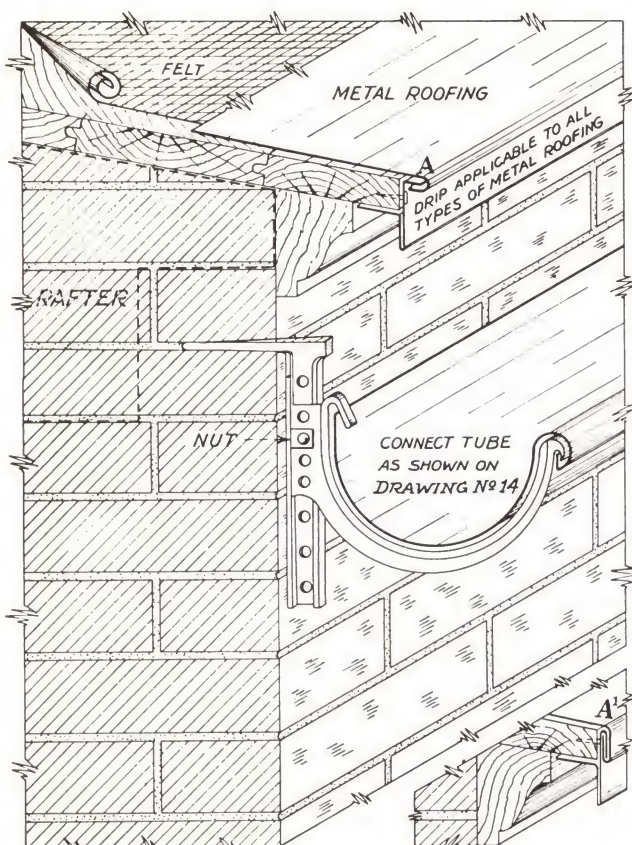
SINGLE BEAD EAVE TROUGH IN CAST HANGER HAVING ADJUSTABLE SHANK TO DRIVE IN BRICK OR STONE WALL SCALE - 2"-1'-0"
